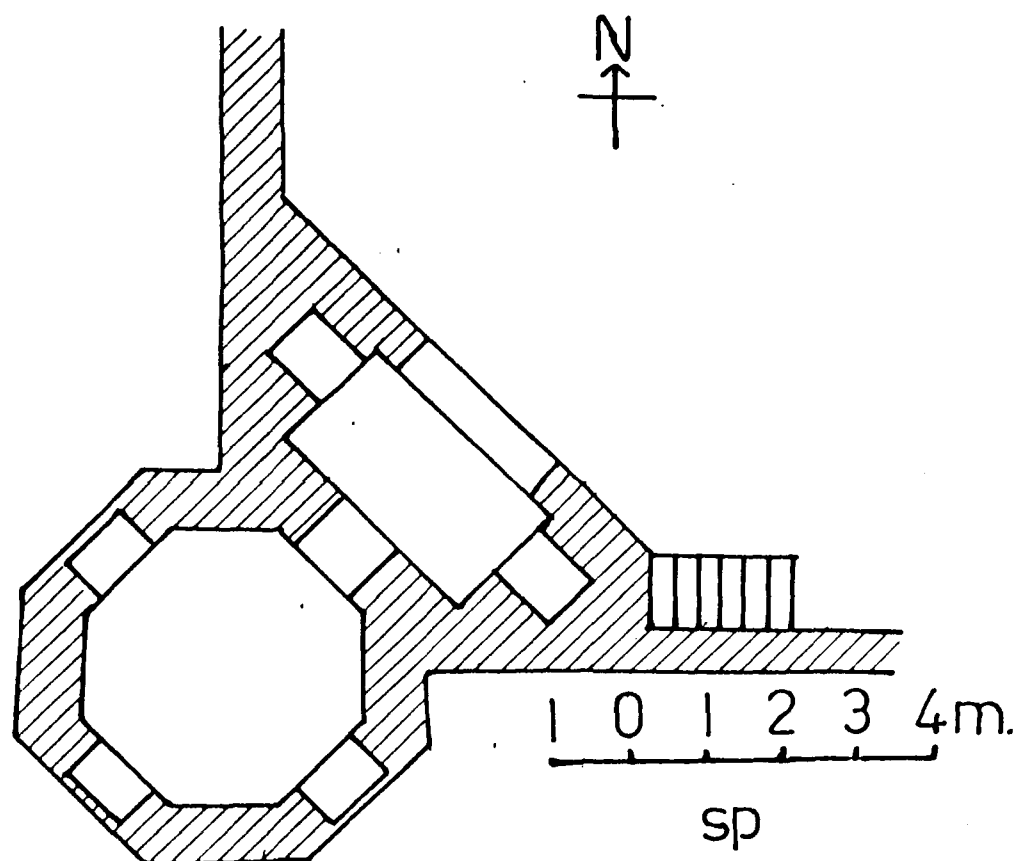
Fig. XIII. Nurmshal : Sarai, plan of the ground floor room
